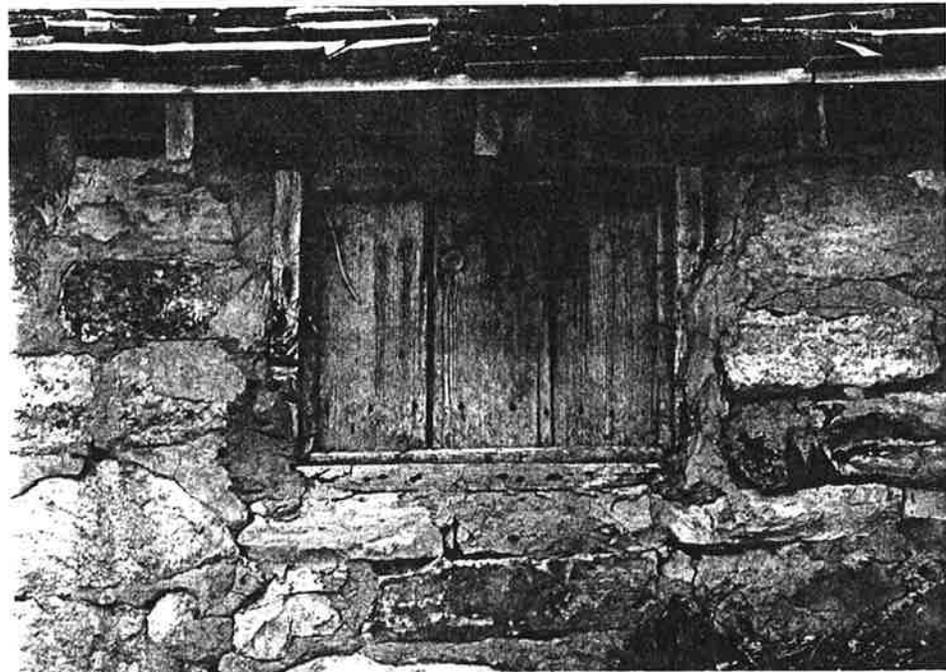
Birch Creek root cellar, showing weathered north window framing. Voids between the framing and masonry have been filled and patched with Portland cement. (Neg. R3-16)
